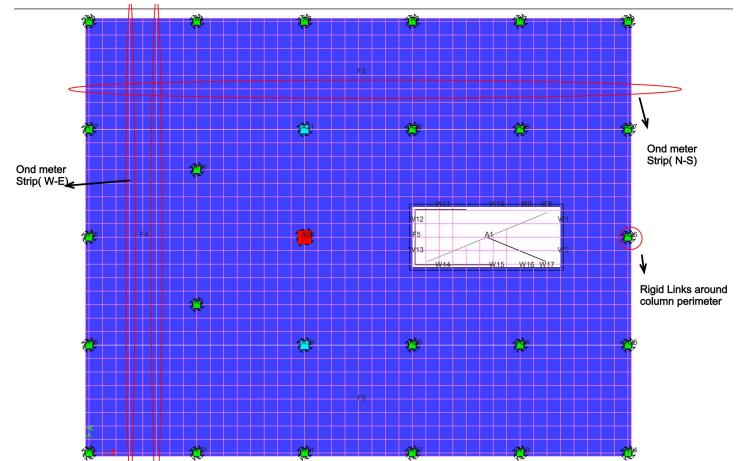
Plan view FEA model at Level 2 (ETABS)
